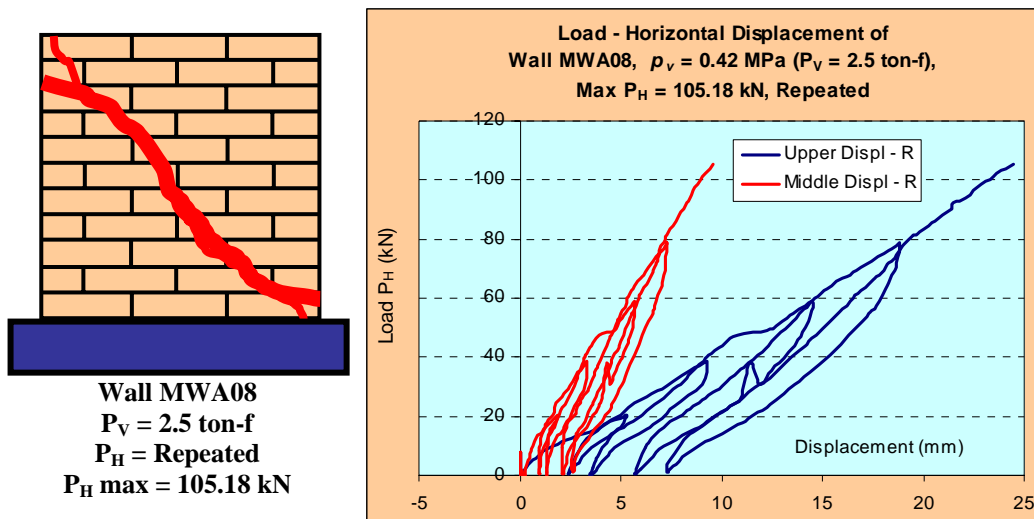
Failure pattern and load-displacement of wall MWA08
